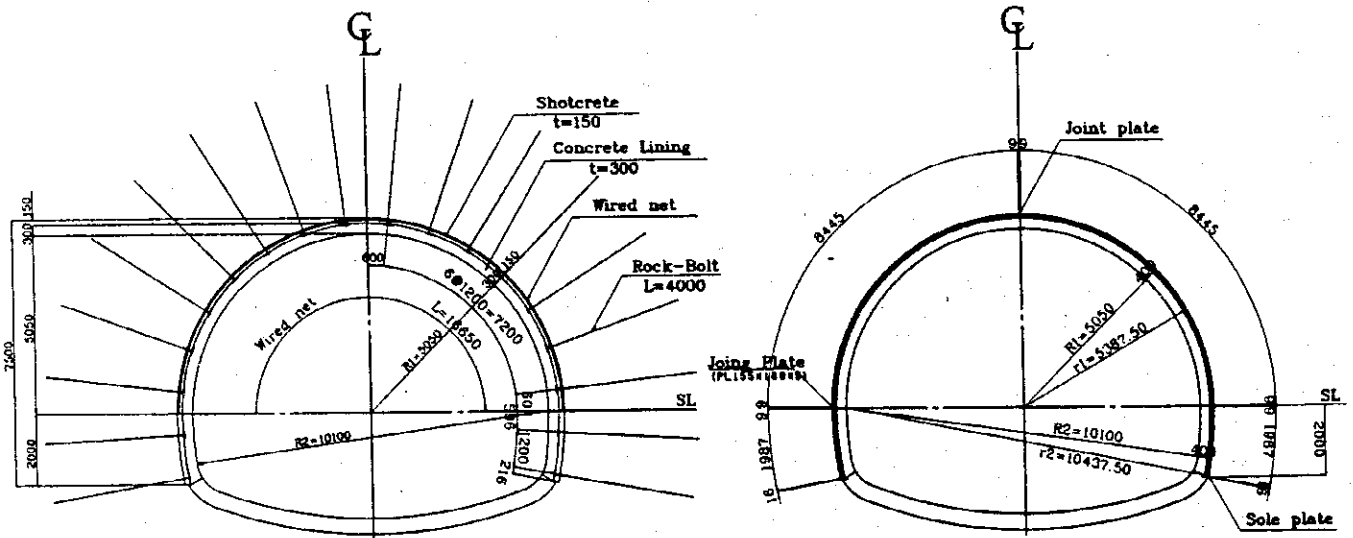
Typical Cross Section of C-1 Route Tunnel (Hard Rock)
